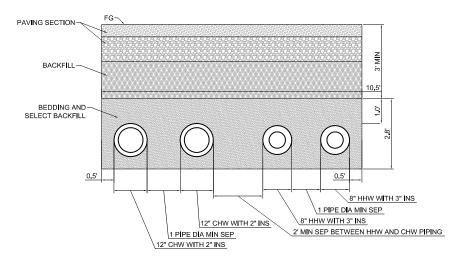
Chilled and Hot Water Combined Trench - Maximum Section
